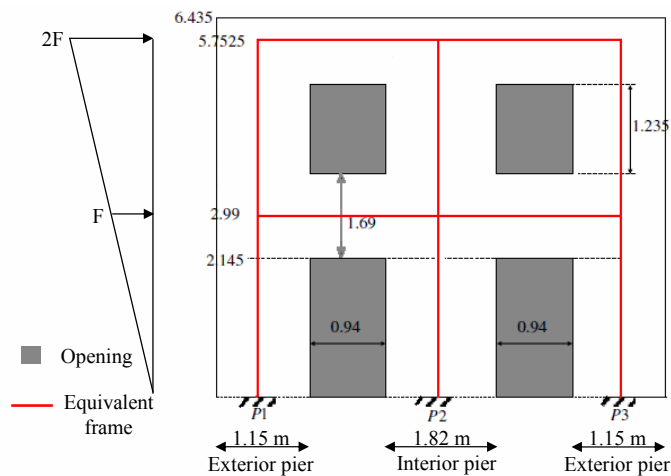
Door wall of the full-scale, two-story unreinforced masonry building tested at Pavia University
